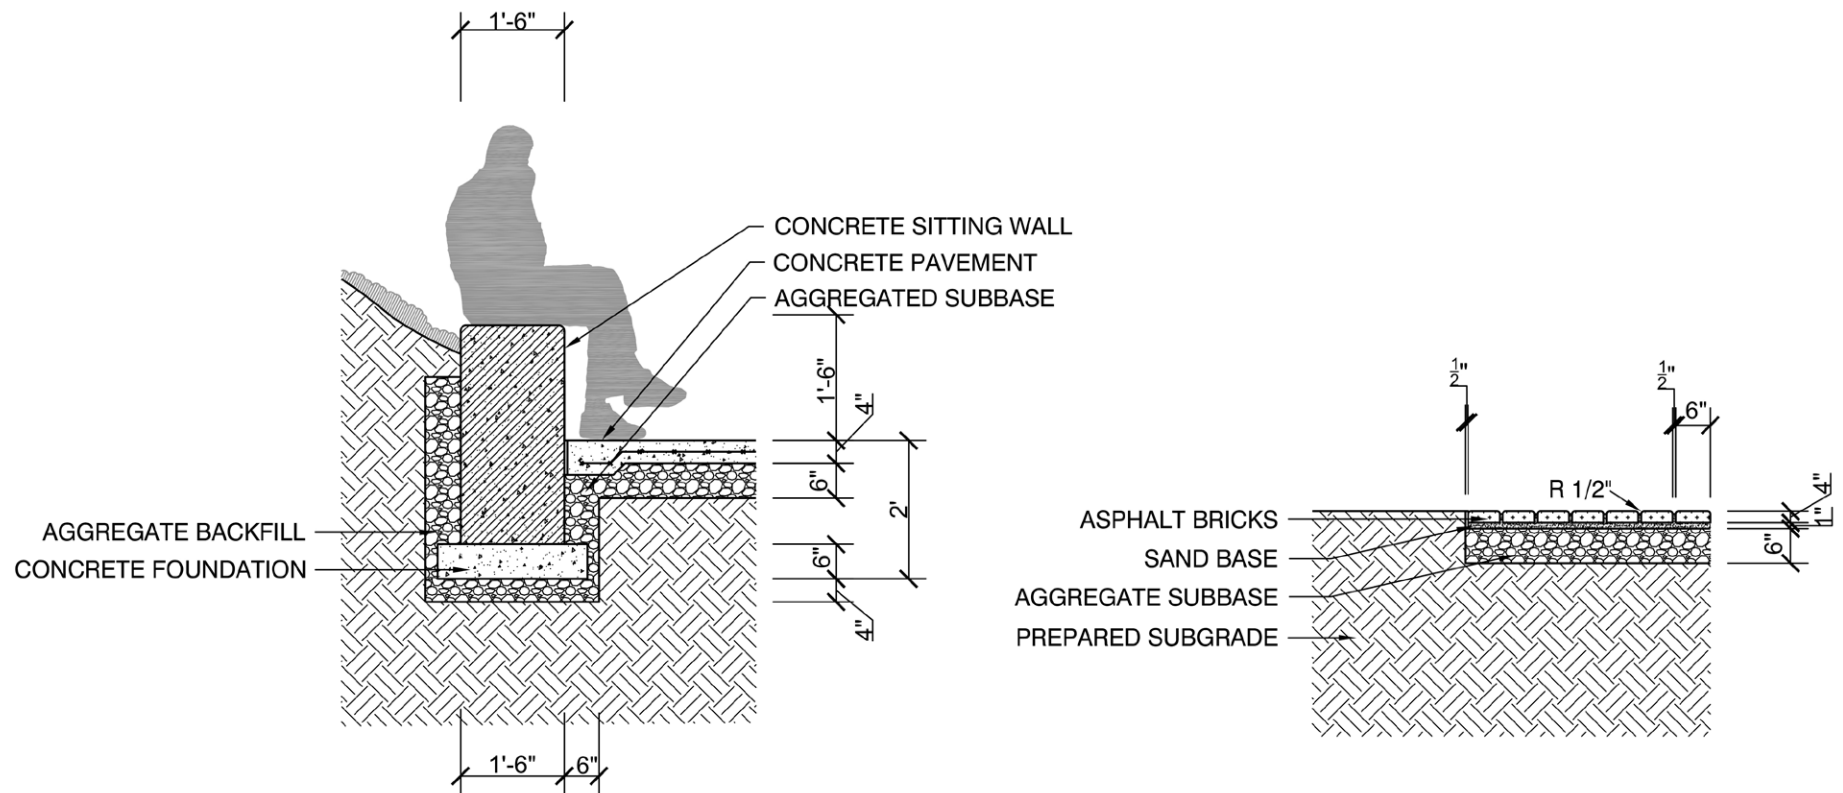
Typical Retaining Wall Seating and Permeable Brike Paving Details
